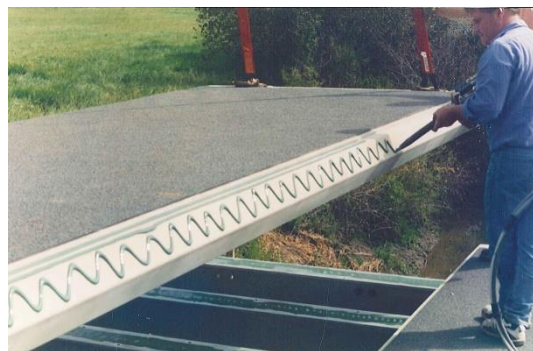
Adhesively bonded connections between FRP components (bridge decks) and steel girders.
